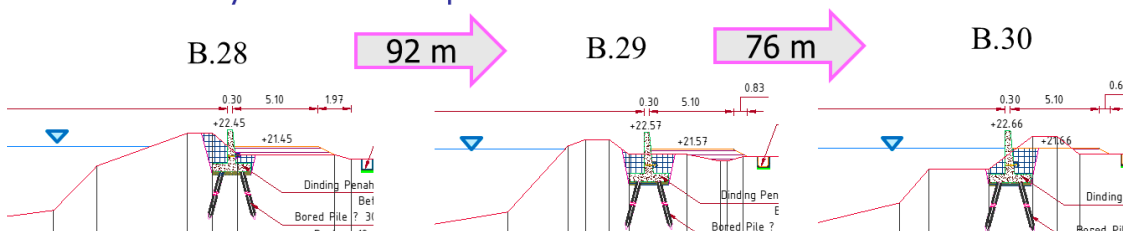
Design Channel Sections of Upstream of Bekasi Weir
